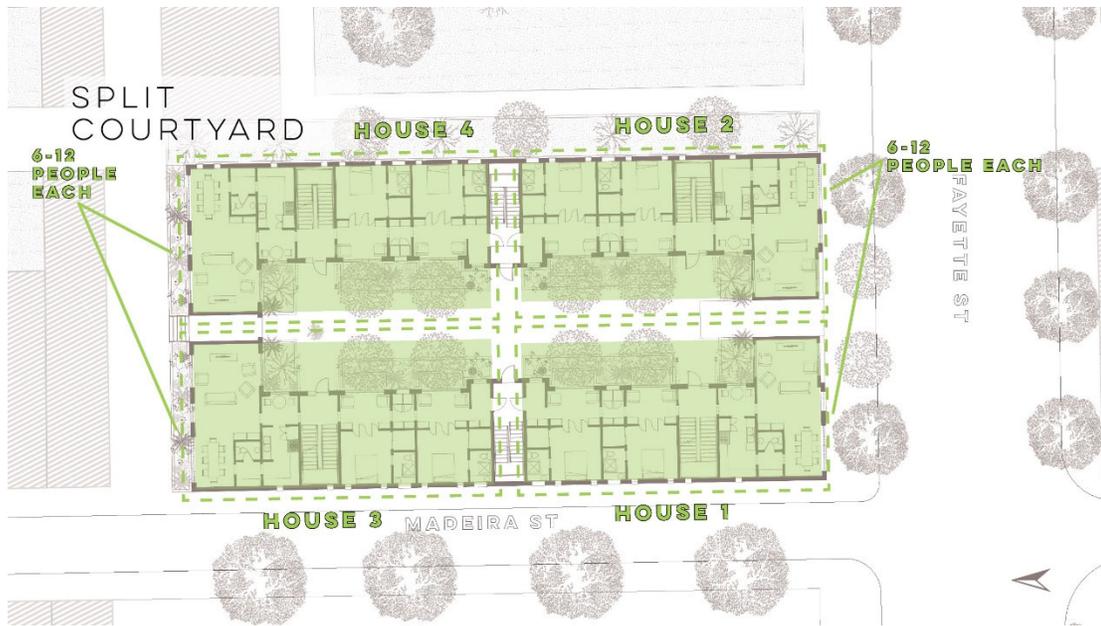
The house layout of the split courtyard lot and their respective occupancies, (Source: Author)
